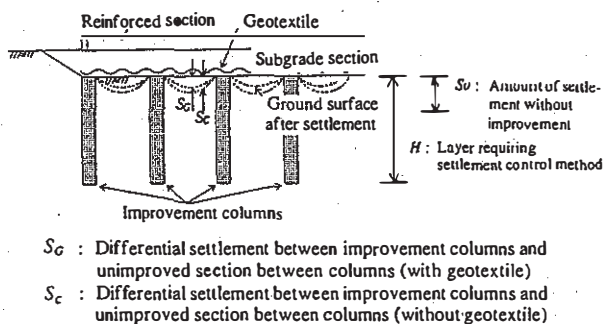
Example of method of controlling differential settlement between improvement columns and unimproved part between columns by using geotextile
